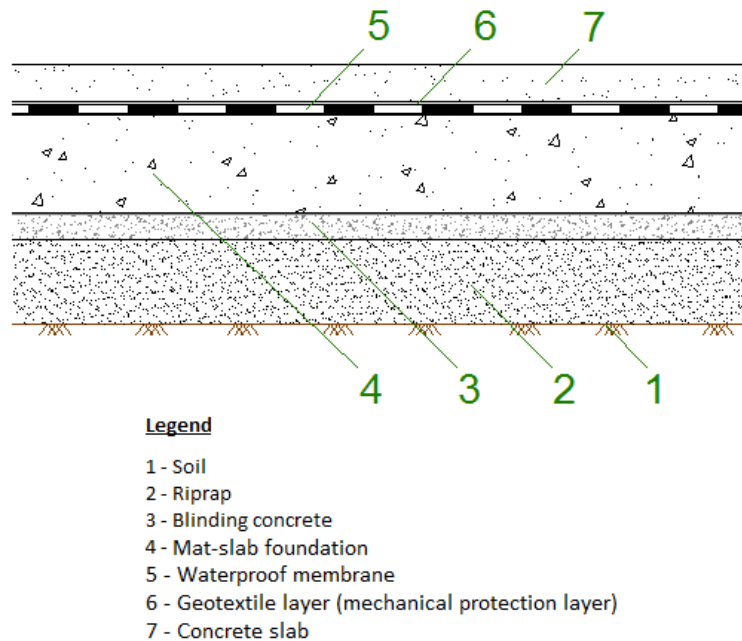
illustrates a coating system in a mat-slab foundation, applied to the bottom surface.
